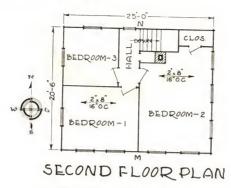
Plan for Second Floor of Old House. Joists Run East and West. Partition MN Is Directly Over DG of Fig. 279
